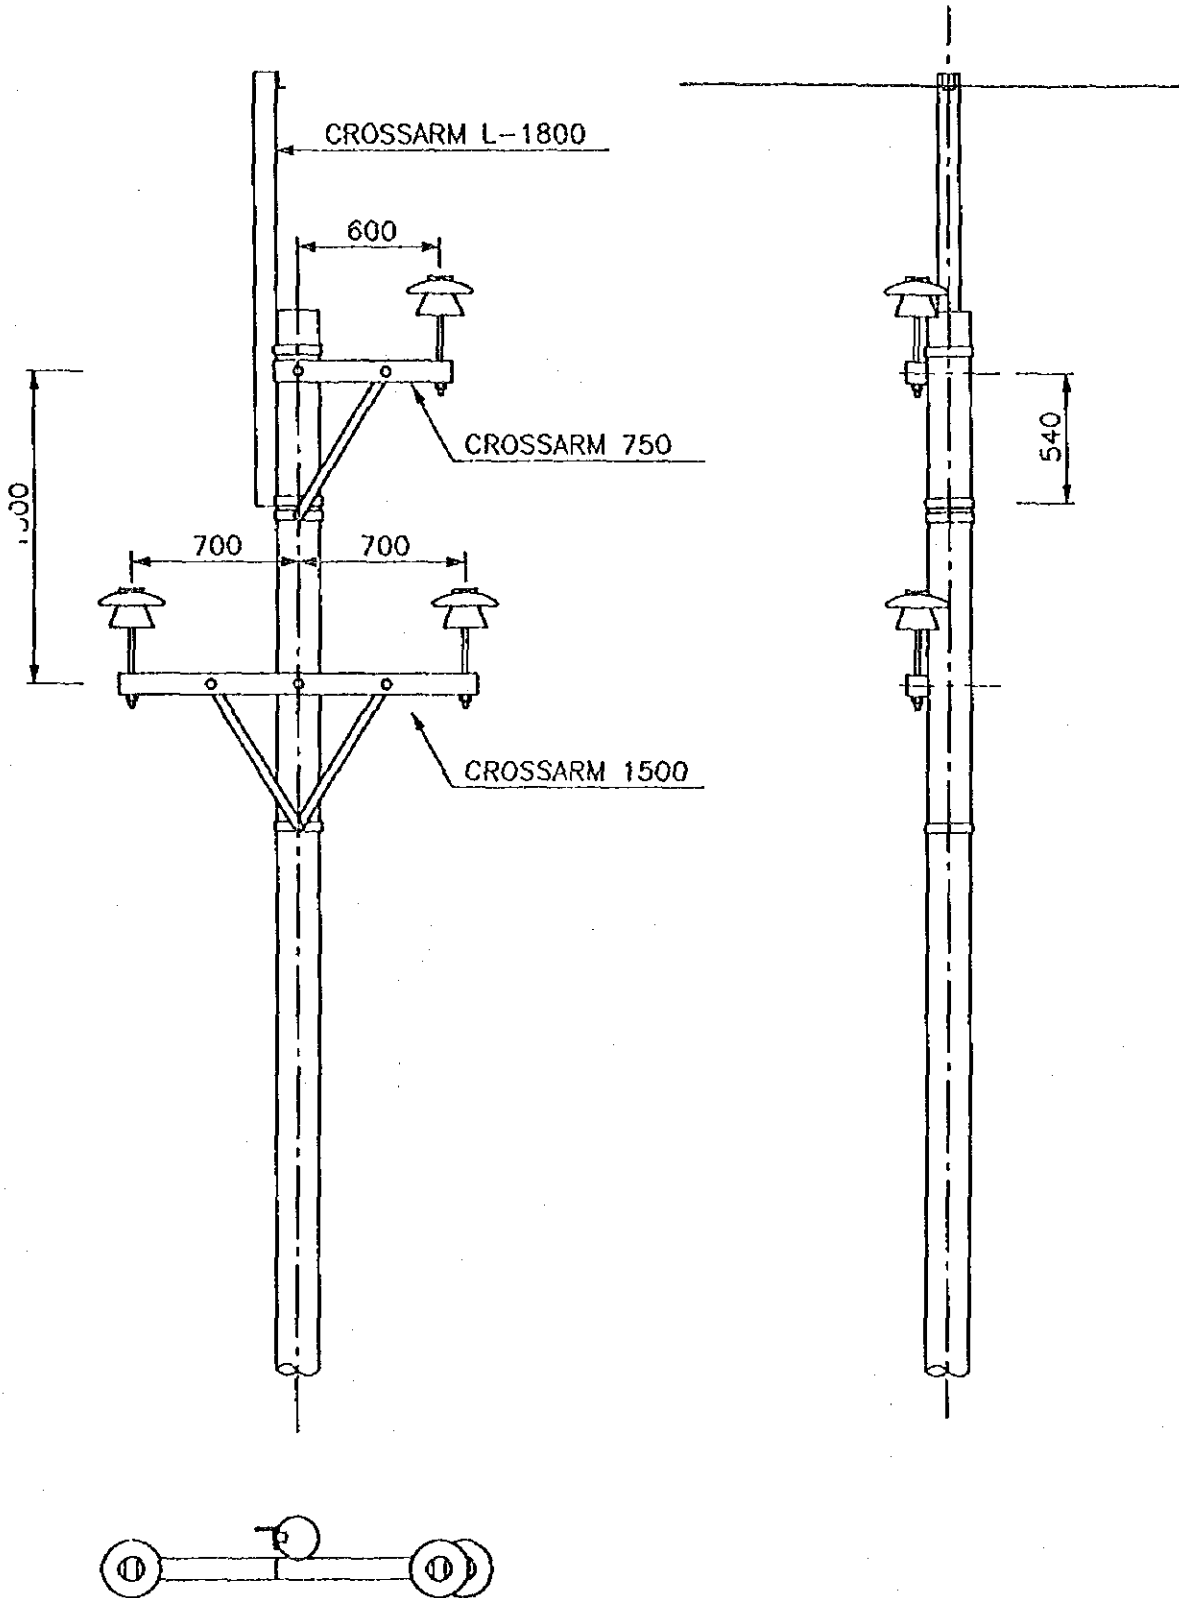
Typical 33kV Pole Assembling (Straight Line)
